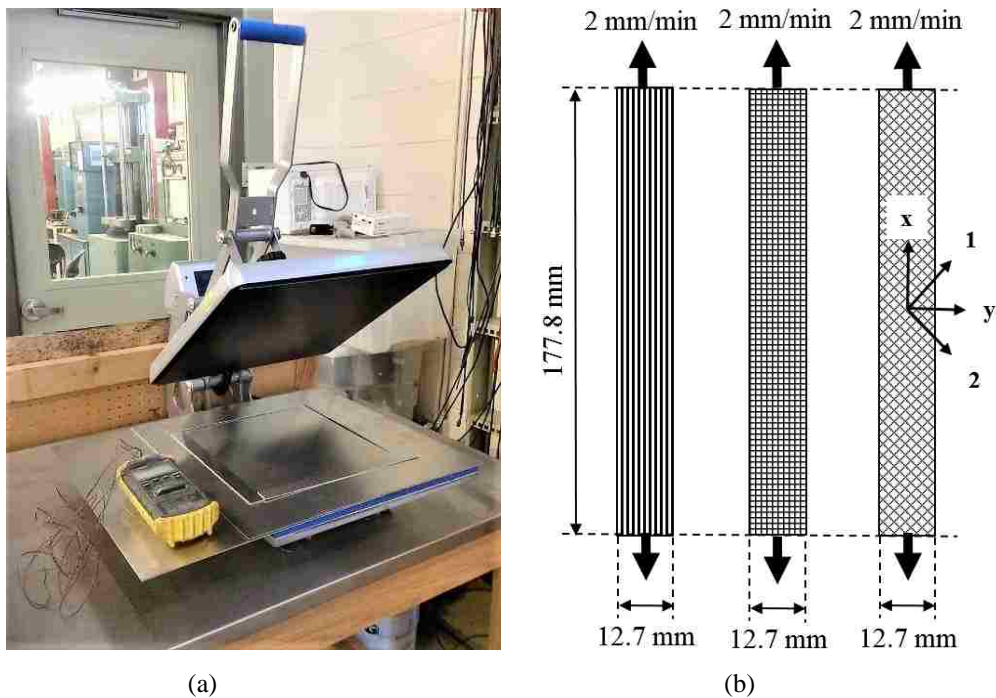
(a) Heat press setup for fabricating flat coupons, and (b) schematics of tension tests for unidirectional on-axis, plain weave on-axis, and plain weave off-axis coupons.
